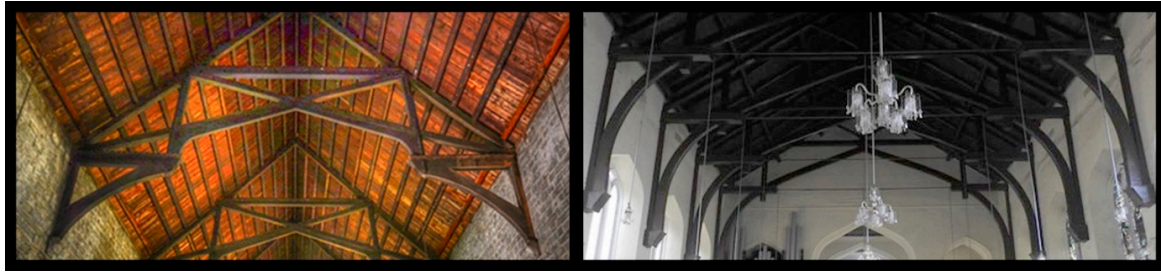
Scissor Truss at St. John in Wilderness (Left) and Hammerbeam Truss at Christ Church, Shimla (Source: Author).
